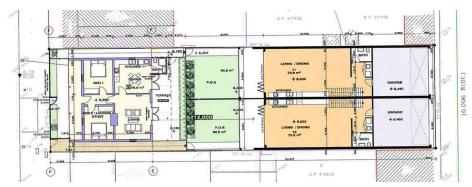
Ground floor plan showing the proposed changes to the cottage and the layout of the terraces behind. (Source: Urbanlink)
